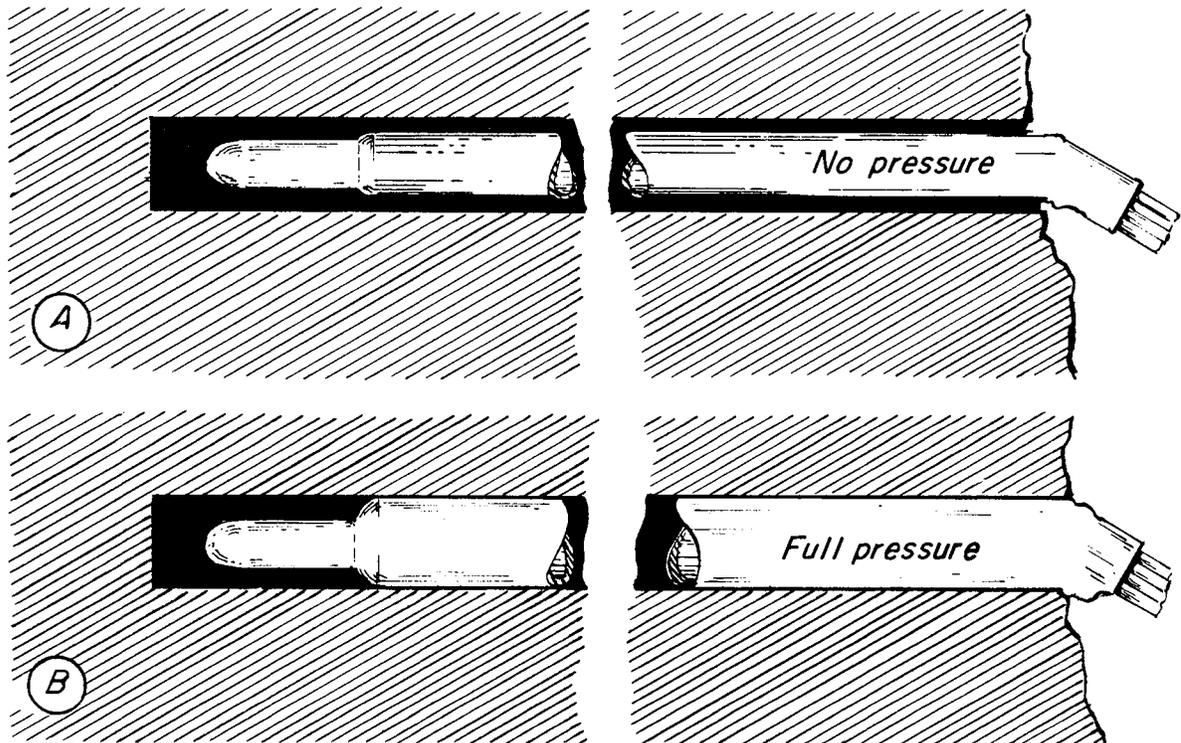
Rubber Seal Used To Infuse Coal Seam. The seal becomes tighter as water pressure increases.
